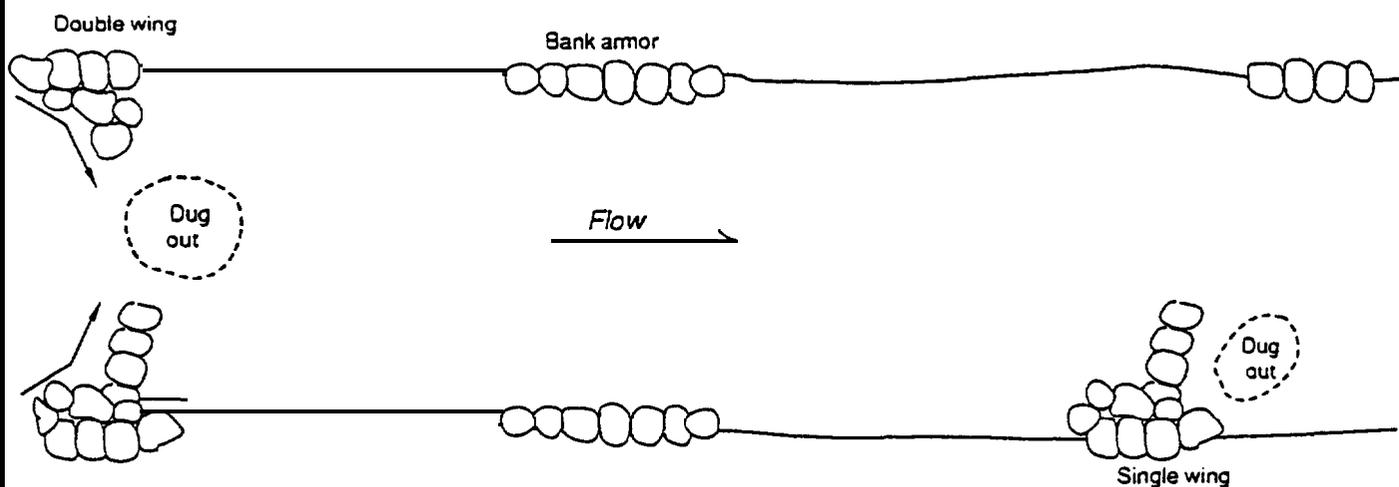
Plan view of rock clusters used in the Potters Pond enhancement project.
